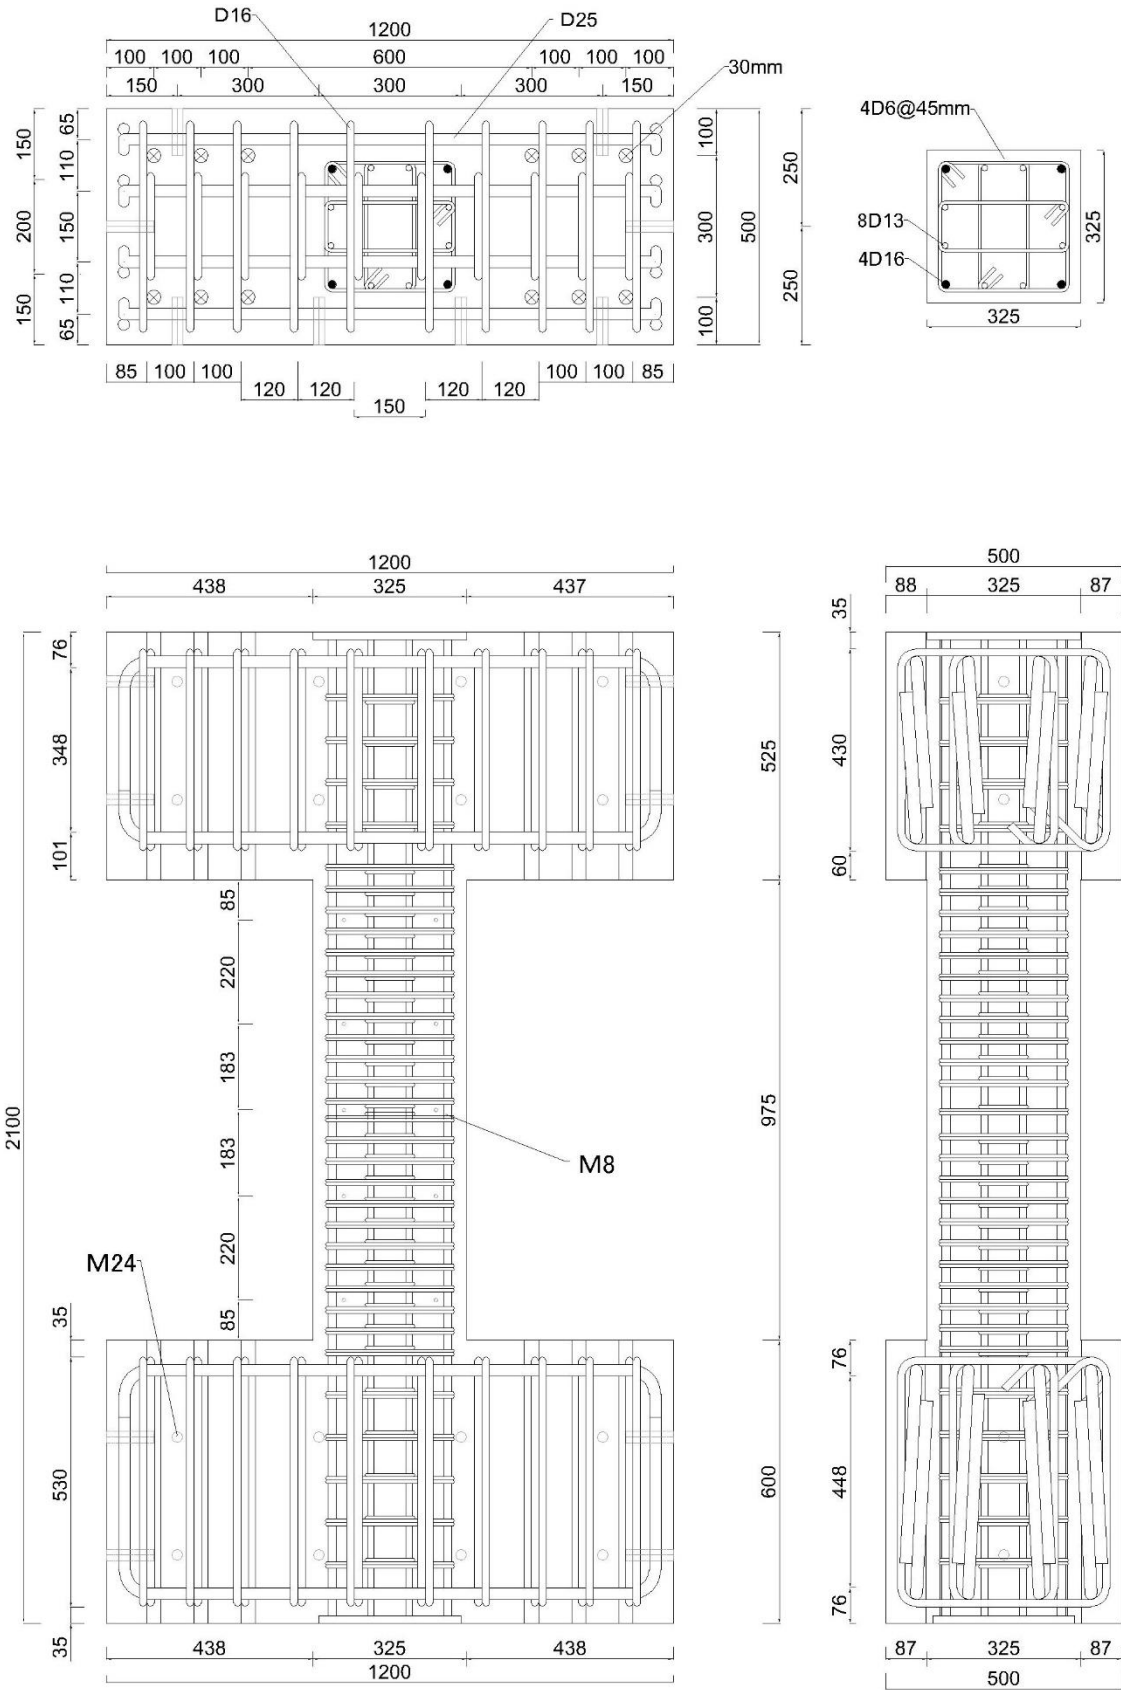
Reinforcement details of the specimens 2-A and 2-B
